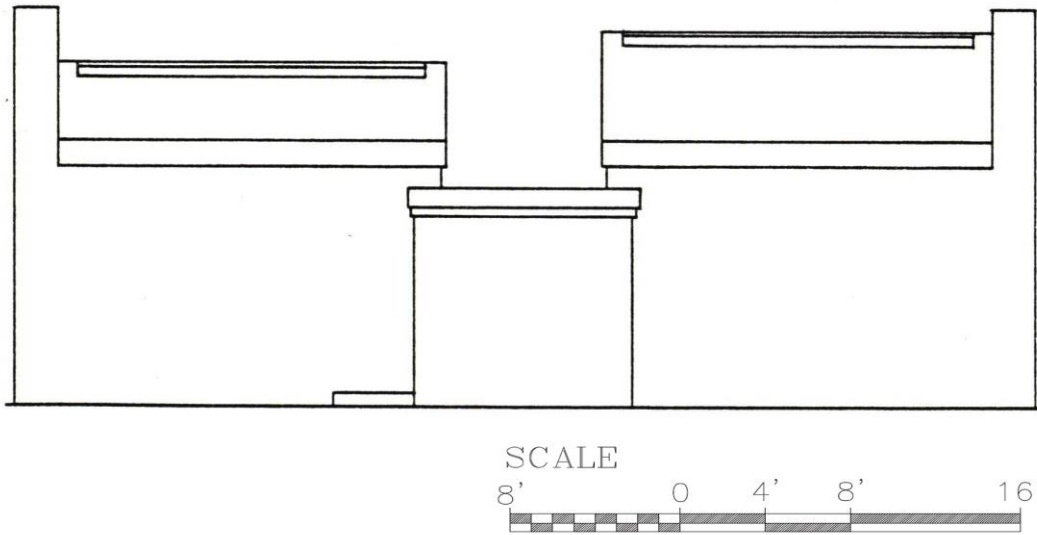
Solar CM House North Elevation (Riley & Schubert, 1985)
